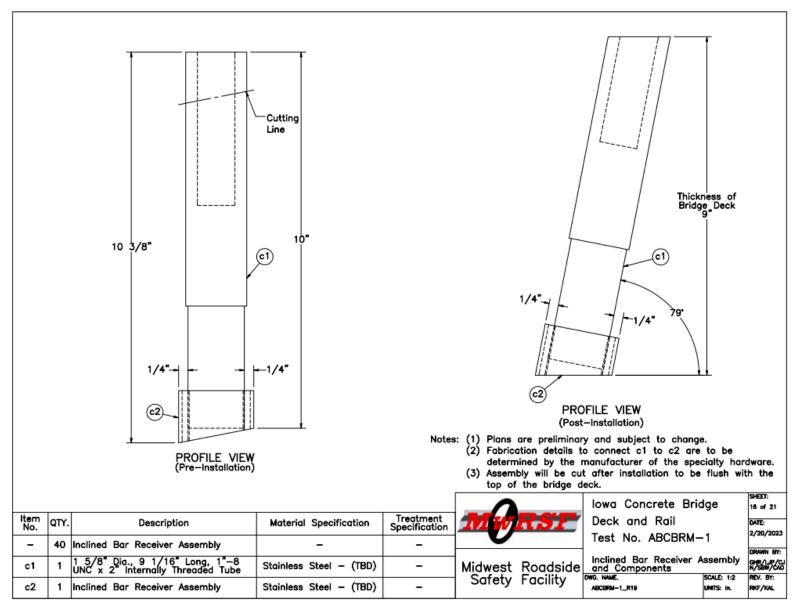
Inclined Bar Receiver Assembly and Components, Test No. ABCBRM-1
